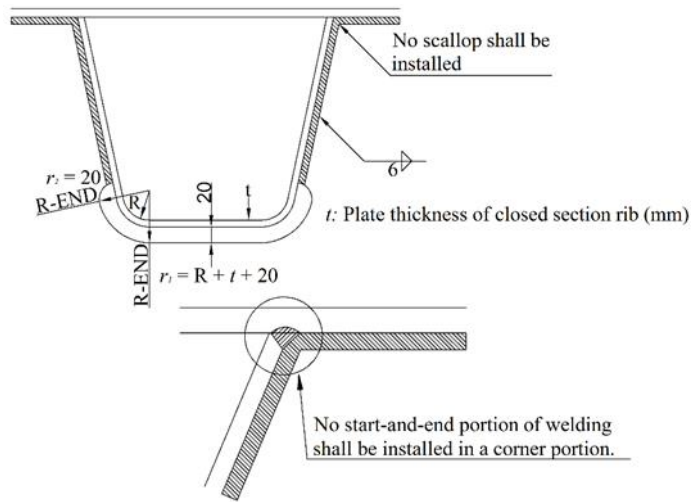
Detail of Crossover Portion and Weld
